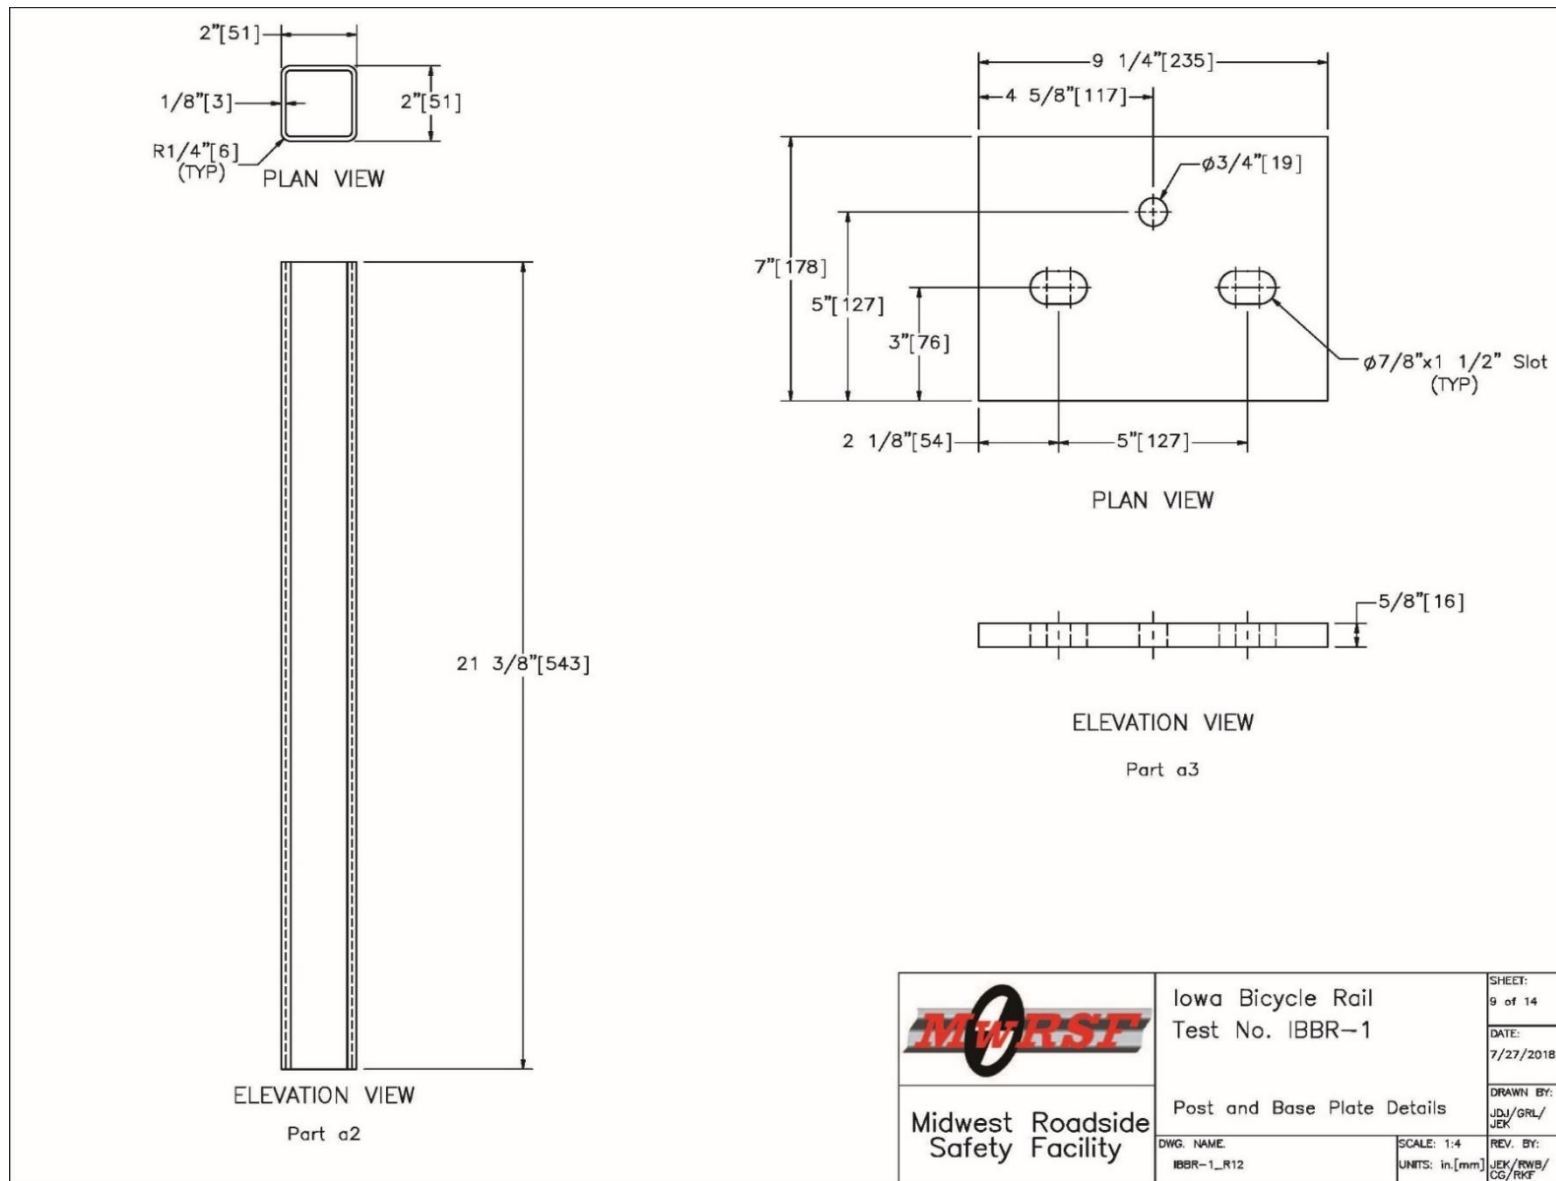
Iowa Bicycle Rail – System Post and Base Plate Details
